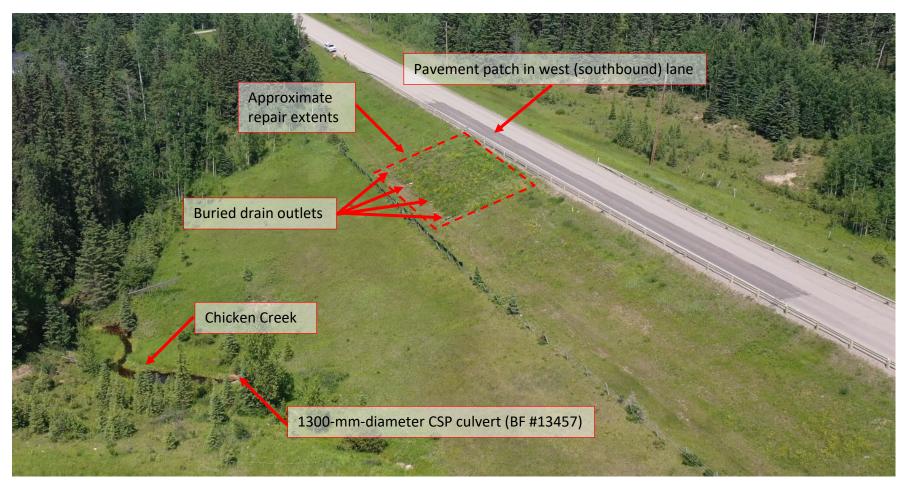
An aerial view of the C072 site, highlighting the slide repair, pavement patch, buried drain outlet locations, and Chicken Creek. Photo taken June 27, 2023, facing north-northeast.
